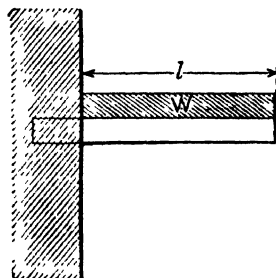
Cantilever Beam. Distributed Load over Entire Span
